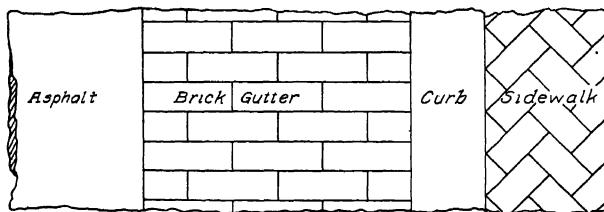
Plan of Asphalt Pavement Showing Use of Vitrified Brick to Form Gutter
